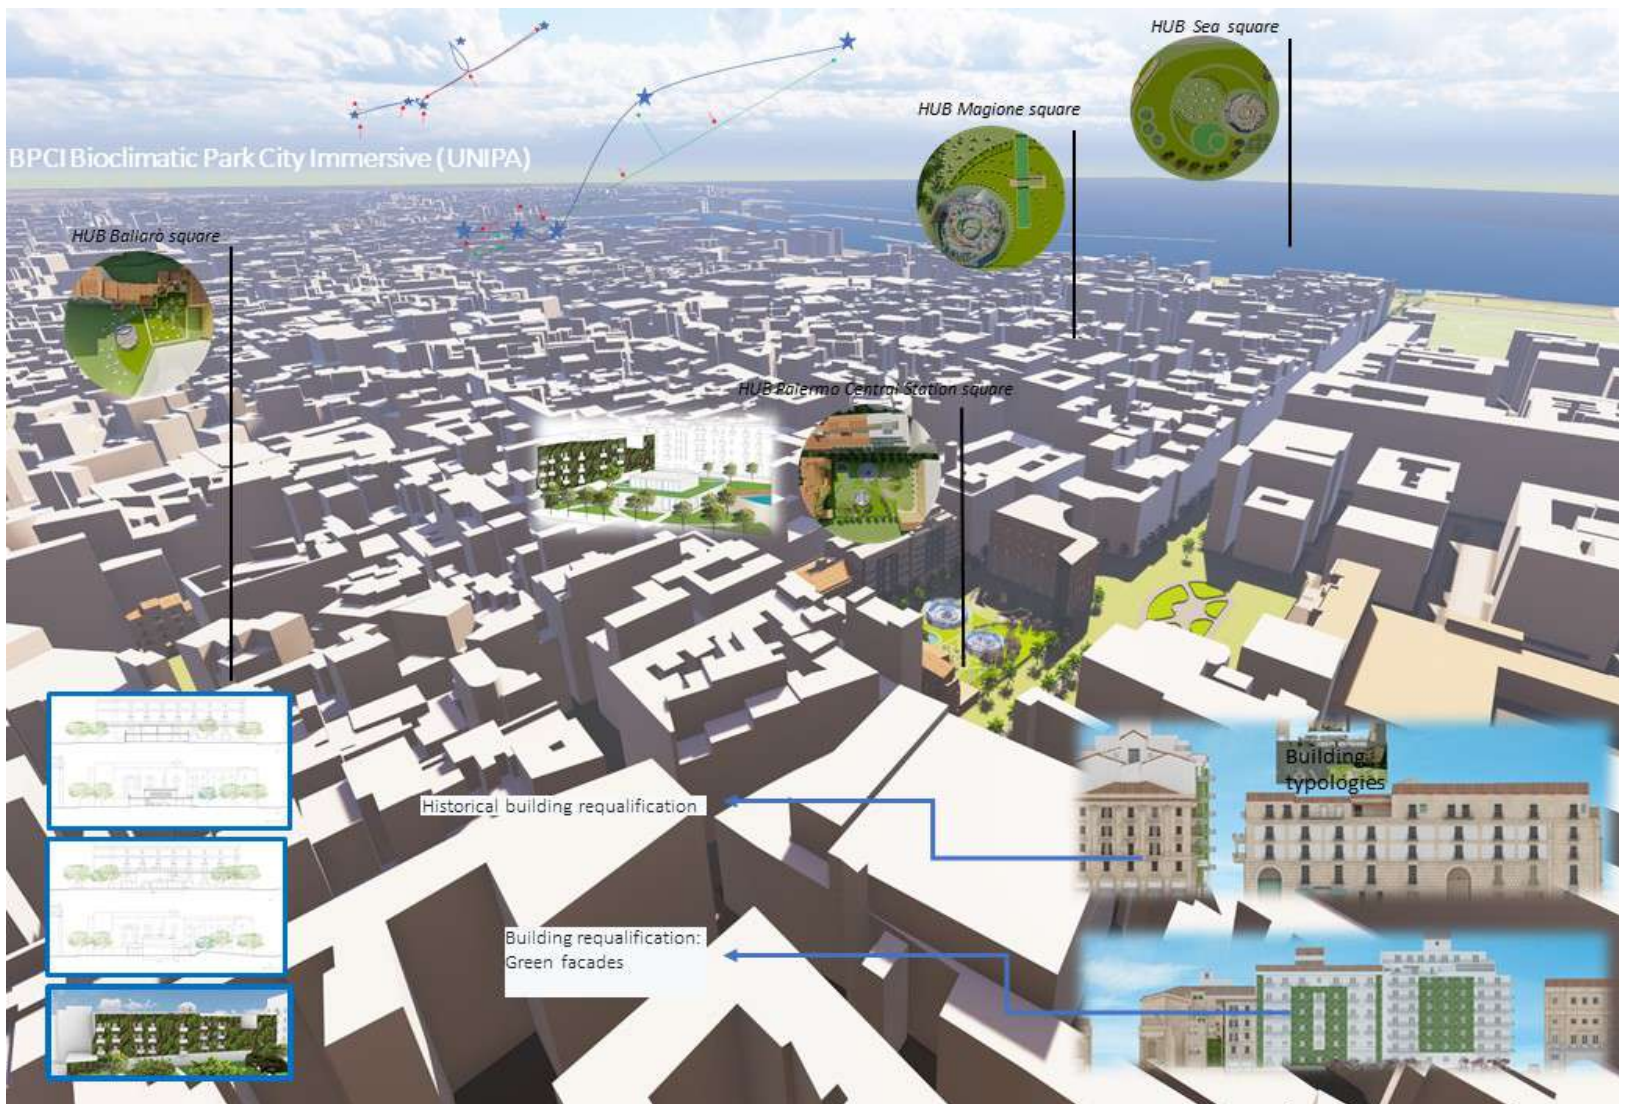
Masterplan of the Green Way Palermo Centrale (via Abramo Lincoln)
